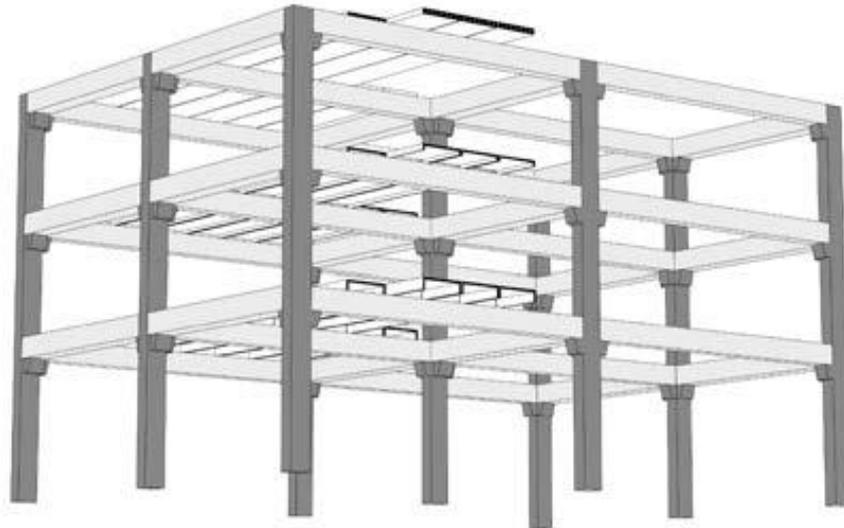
Hinged Frame System (Hernandez and Cladera, 2011)
